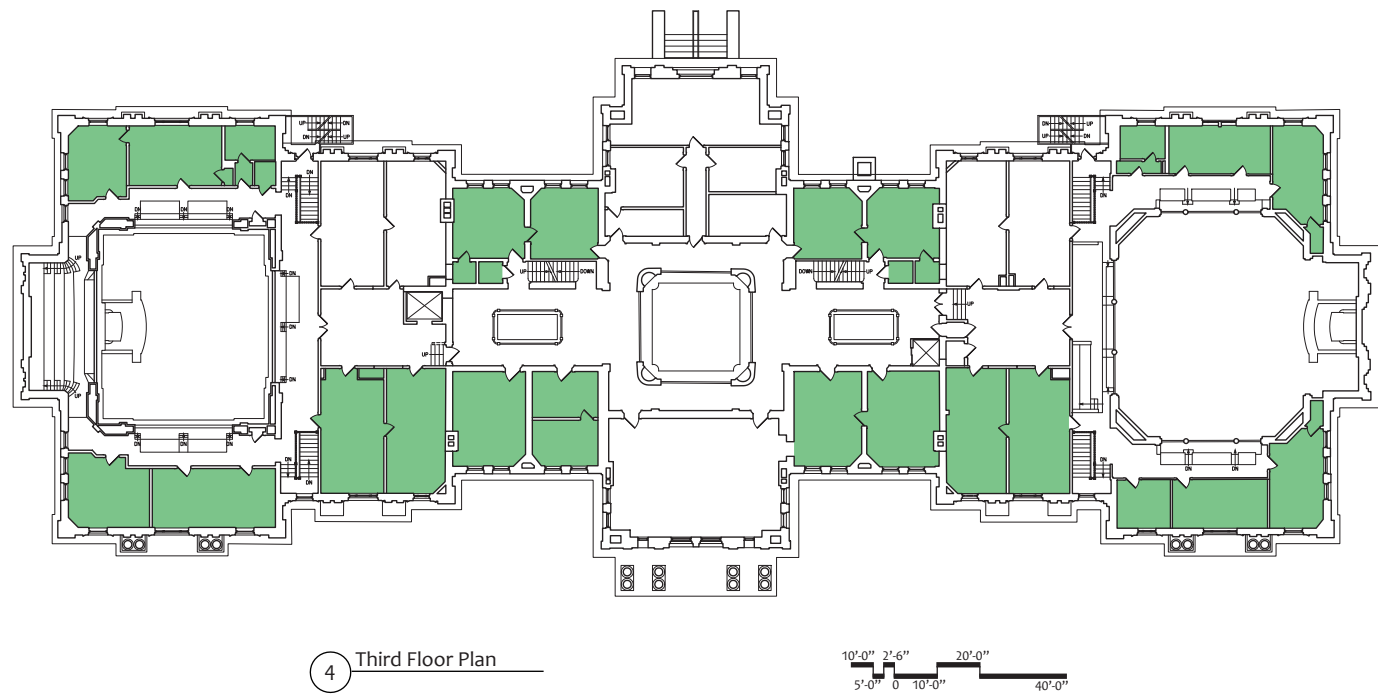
Third Floor Plan [Office Suites highlighted in green]
